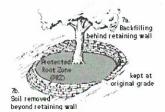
If you change the grade within the root zone, use retaining walls to keep as much of the original grade as possible. a)backfilling; b) cutting.
